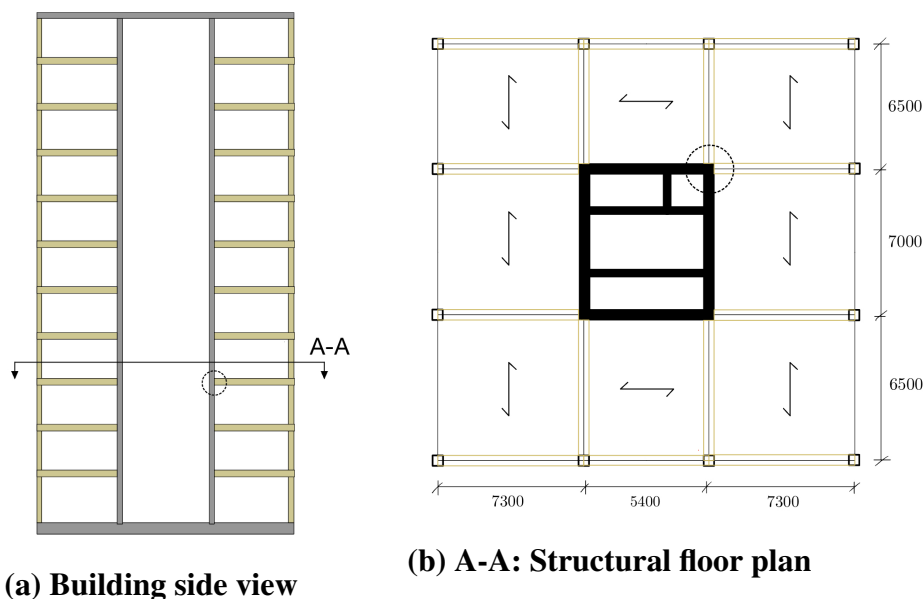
a) Side view of structural system b) Structural floor plan with circled position for connection
